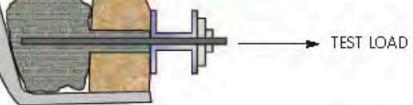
FIXING TERRA COTTA CORNICE TO BRICK PARAPET
